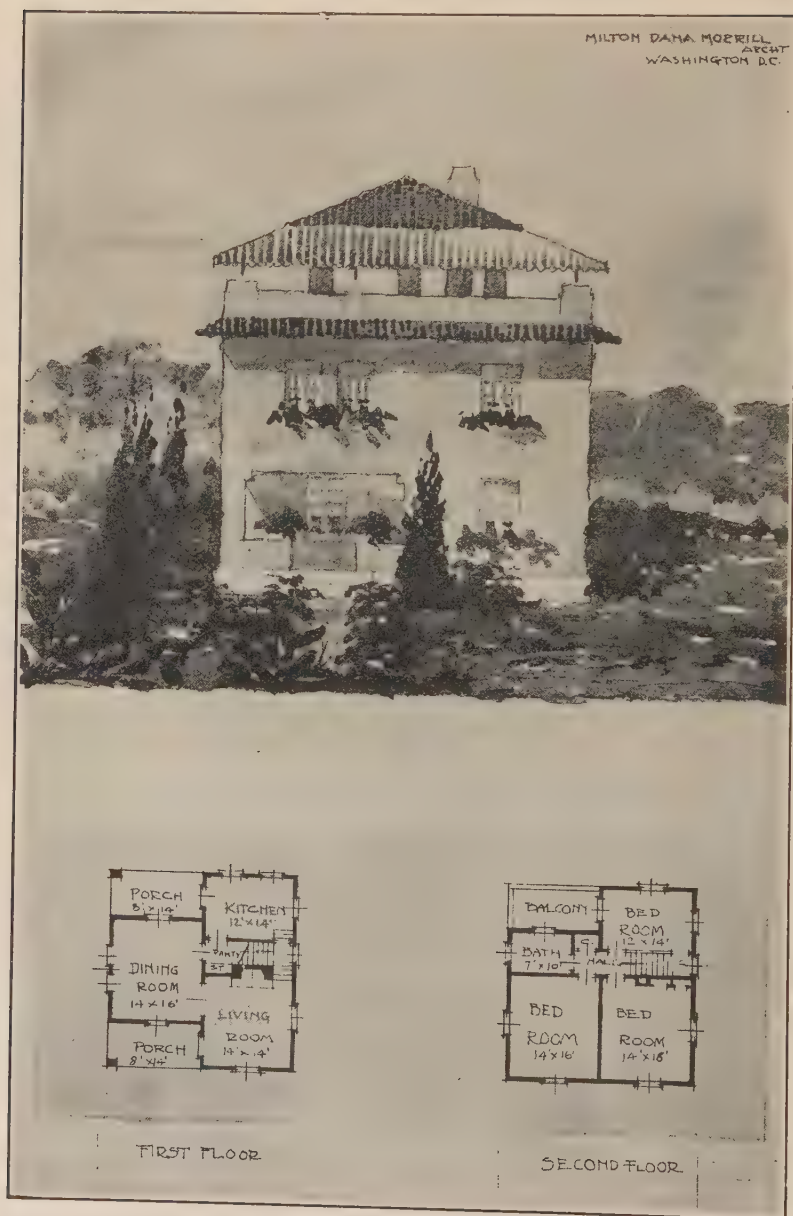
DESIGN FOR A SIX-ROOM CONCRETE HOUSE.
